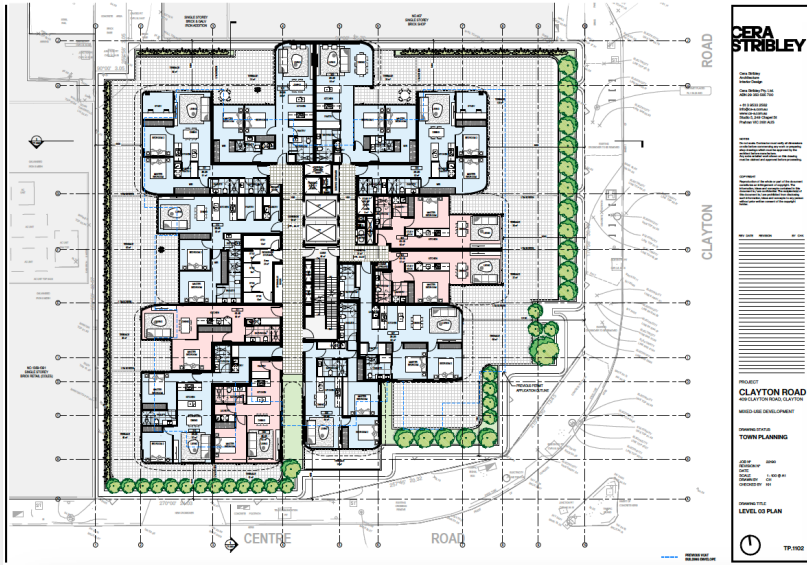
Podium Level layout plan, prepared by Cera Stribley
